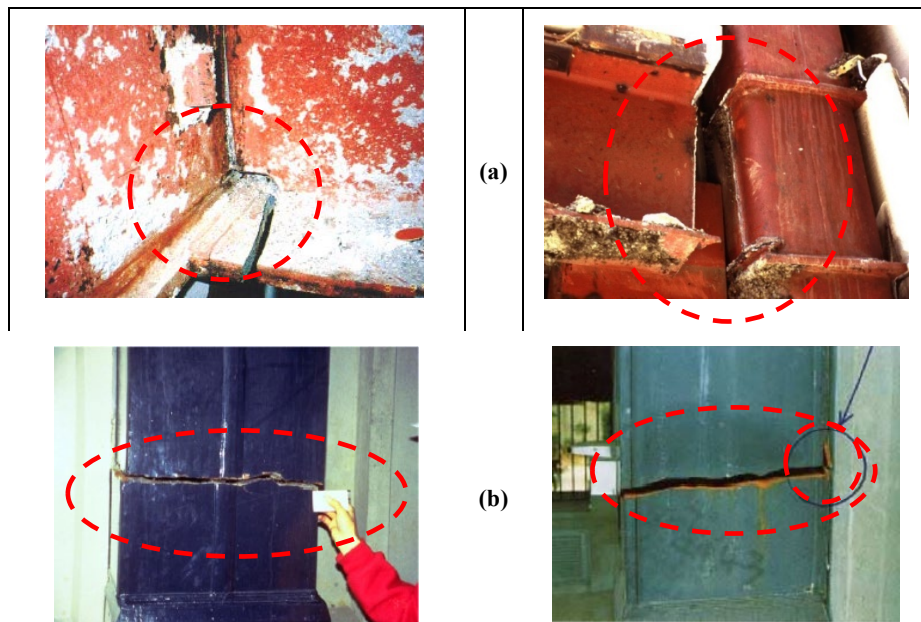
Brittle damage from Kobe earthquake, (a) beam to column fracture, (b) column fractures [48,49]
